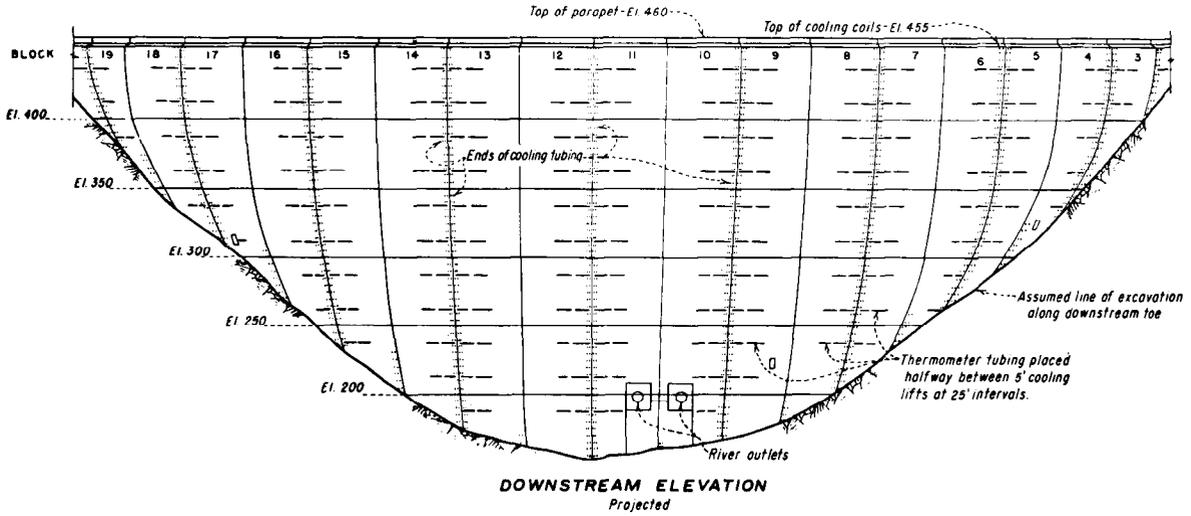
Monticello Dam—cooling pipe layout.—288-D-3023
